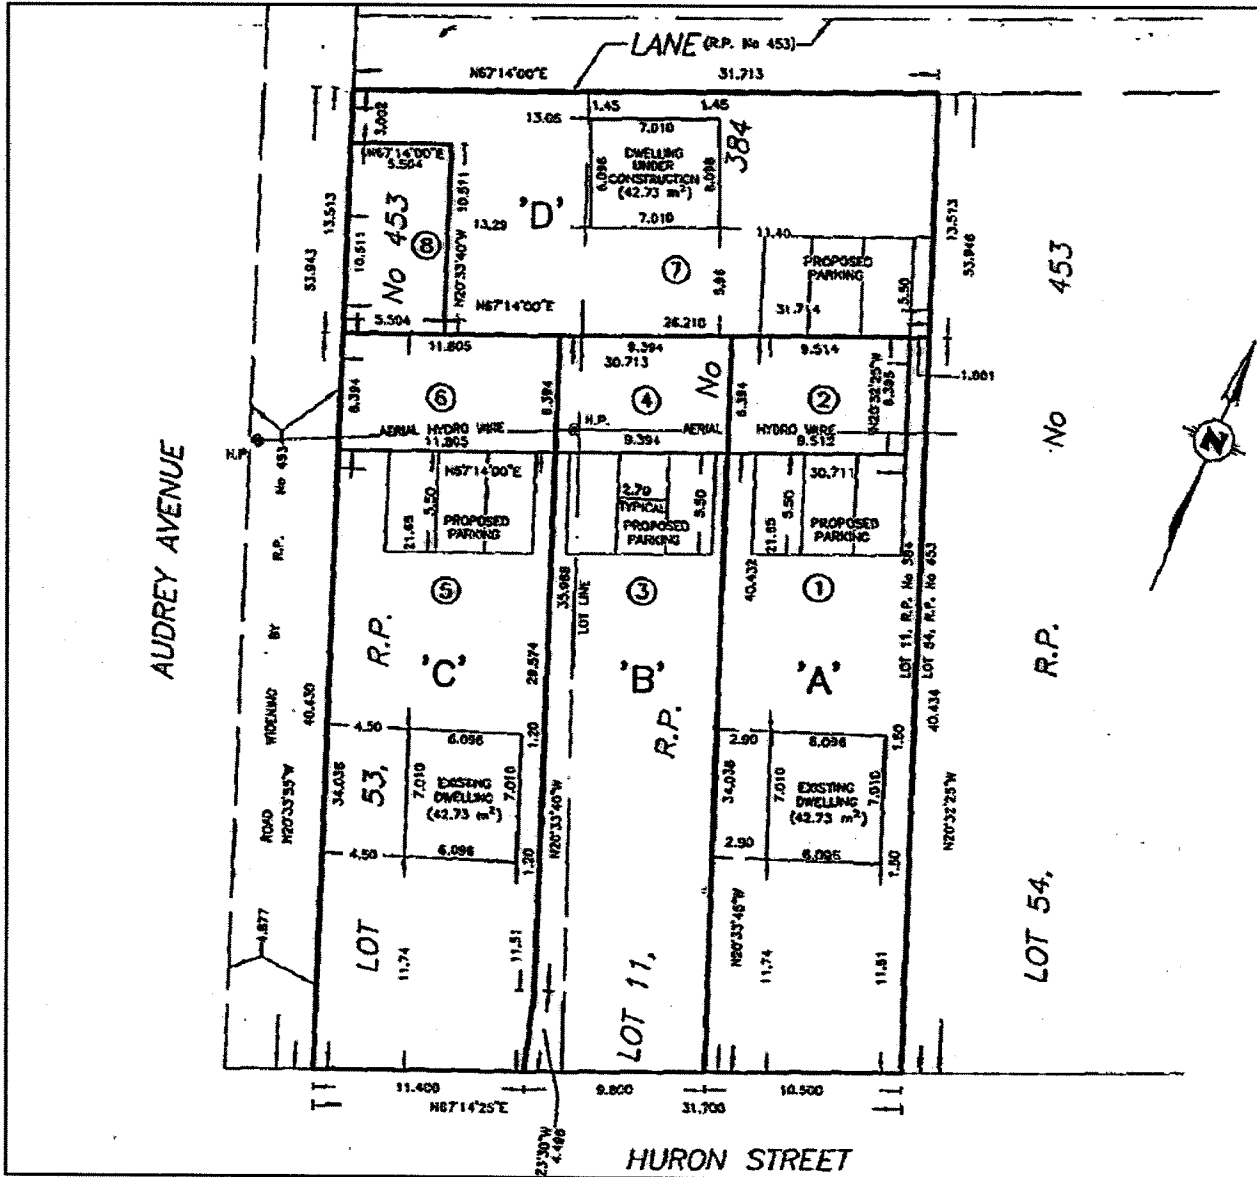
Proposed lot fabric of 1 new additional residential lot (depicted as lot 'B')
